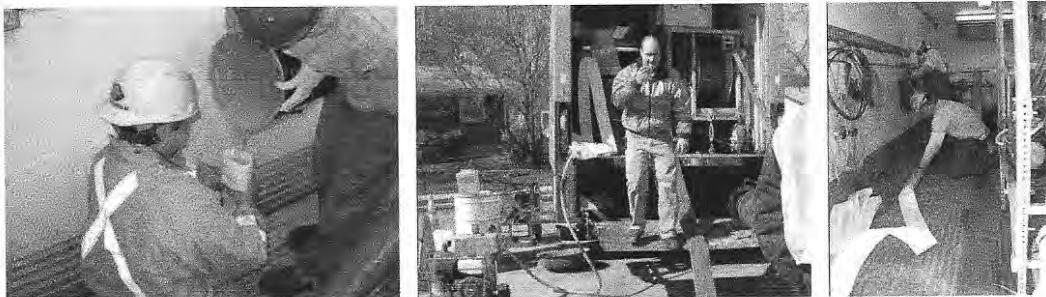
Liner Impregnation with Resin. Left: Pouring the Resin into the Tube. Middle: Vacuum Hose Connected to the Tube. Right: Vacuum Impregnation.
